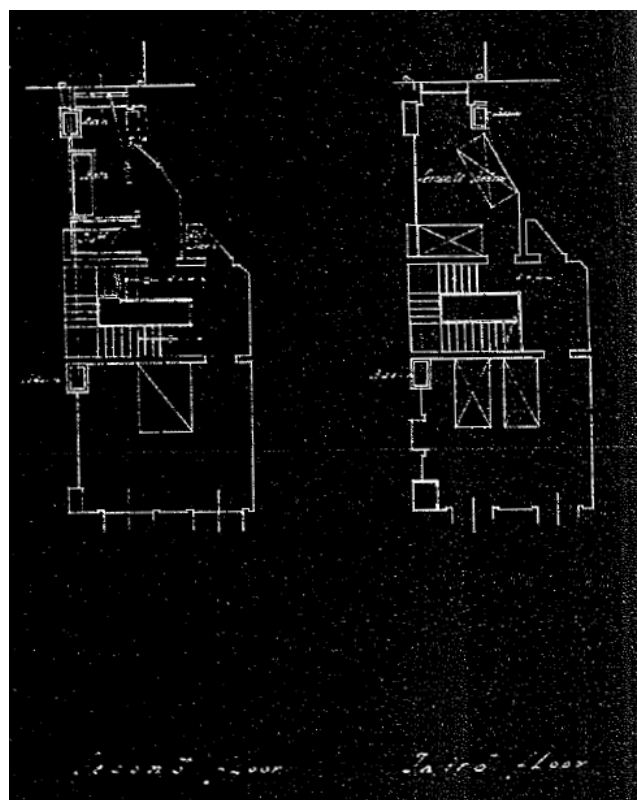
1926 drainage plans of no. 17 Park Square East. Second (left) and third (right) floors. Camden archives.
